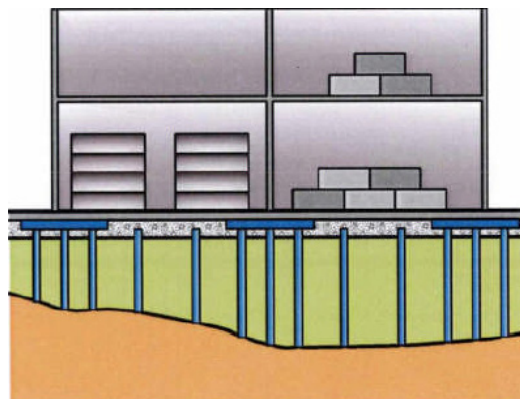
Slabs and foundations of industrial buildings (ASIRI, 2012)
